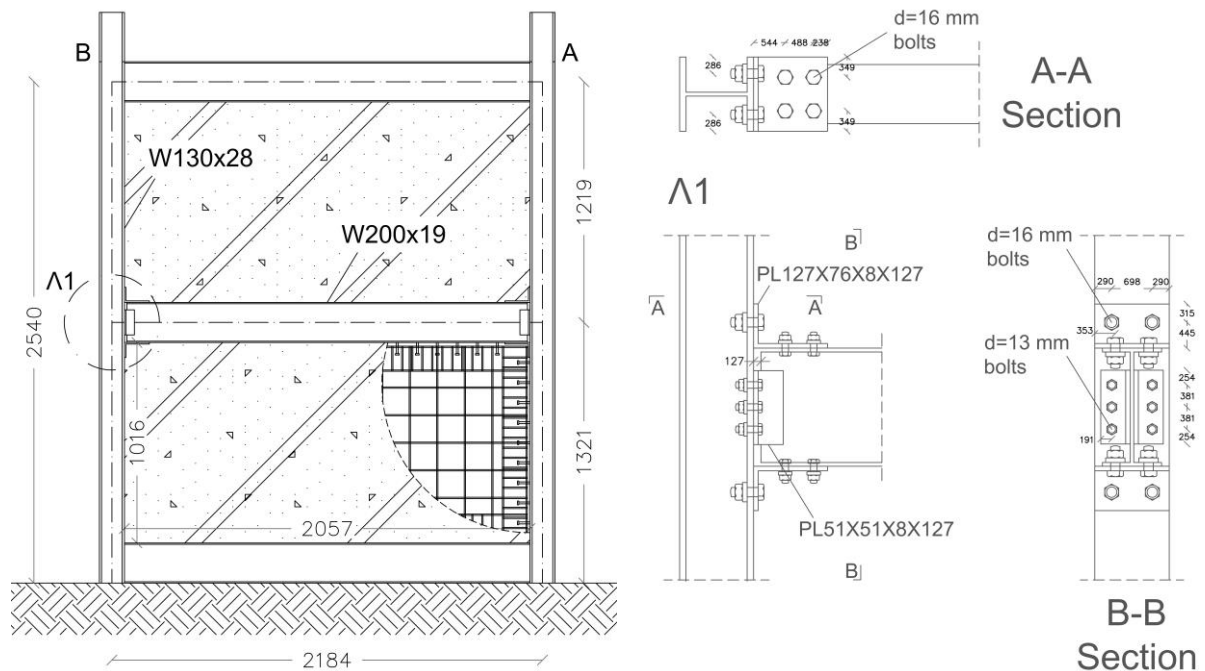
PRSRCW a) Specimen dimensions, b) PR connection detail (units: mm)
